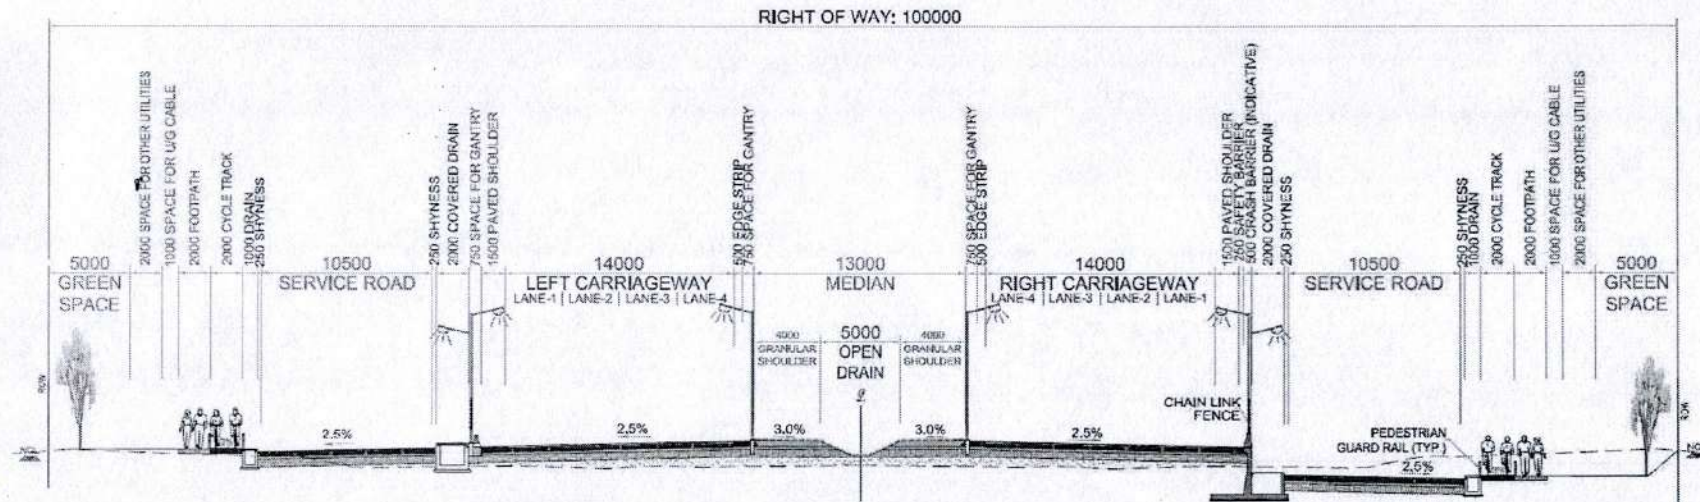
Typical cross section of PRR with RSR lower than Main road
